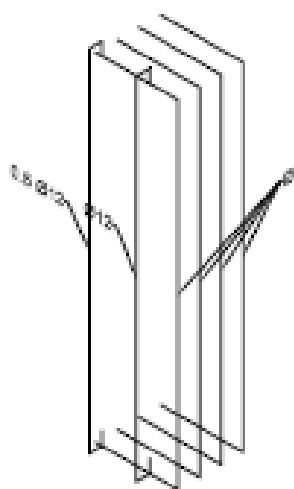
Example placing reinforcement IV1625 [4, p. 112]
